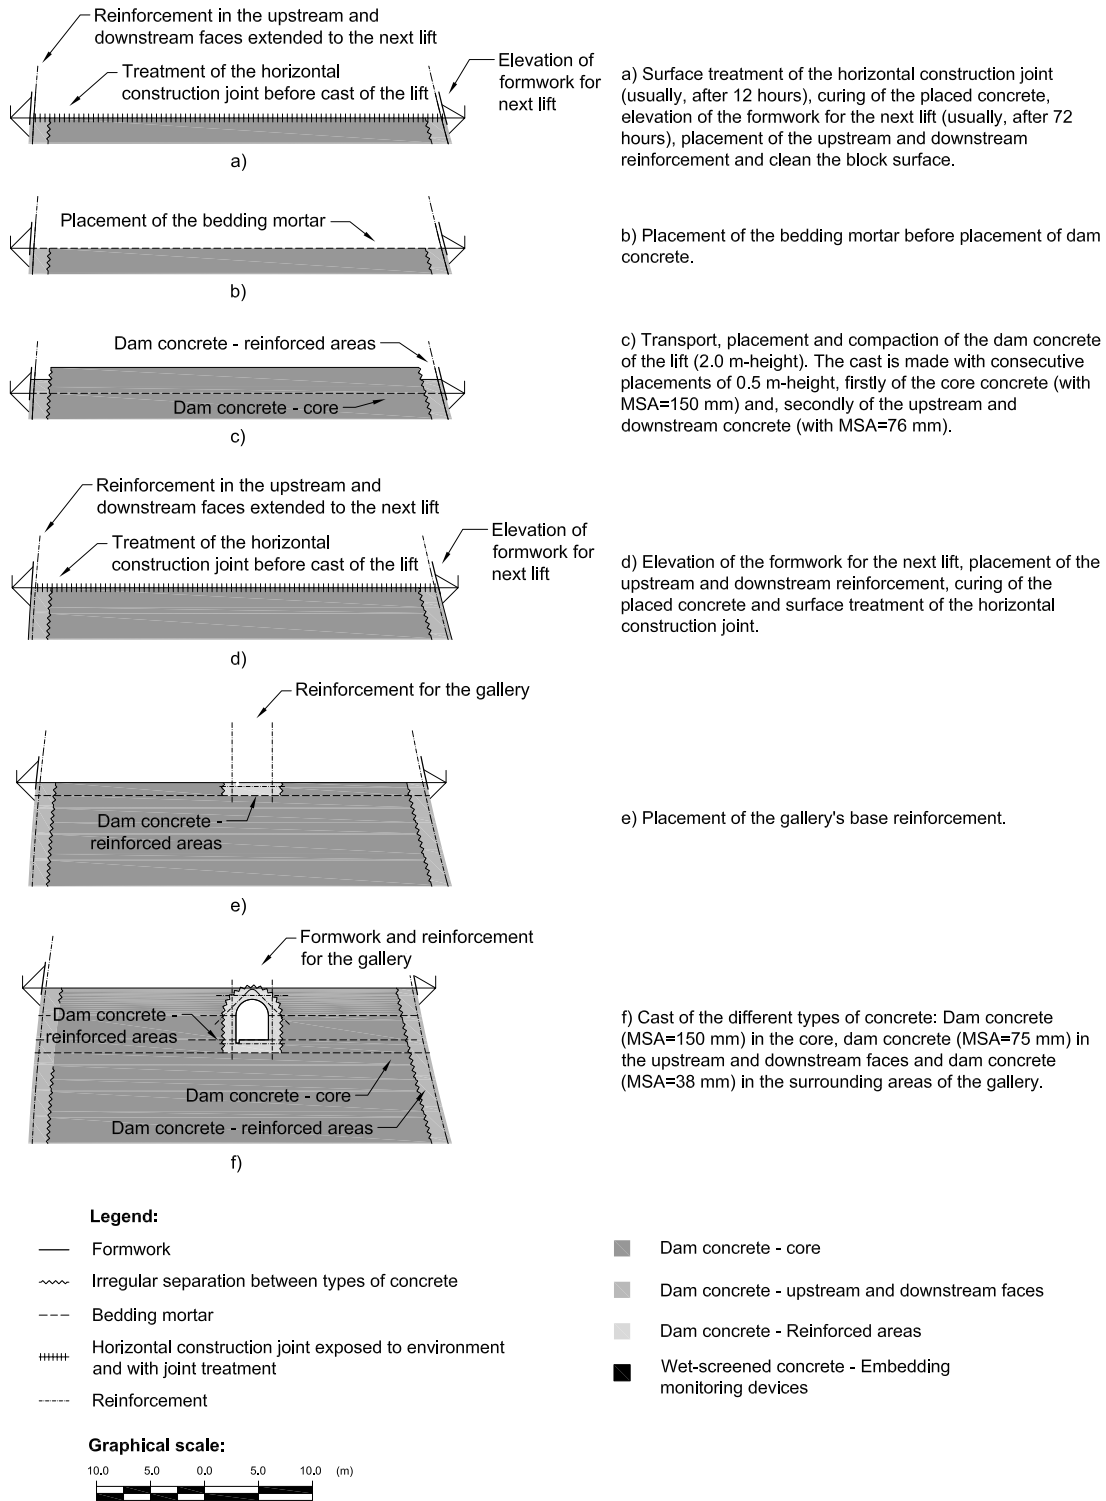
Construction phases and placement of each type of concrete. Example with gallery
